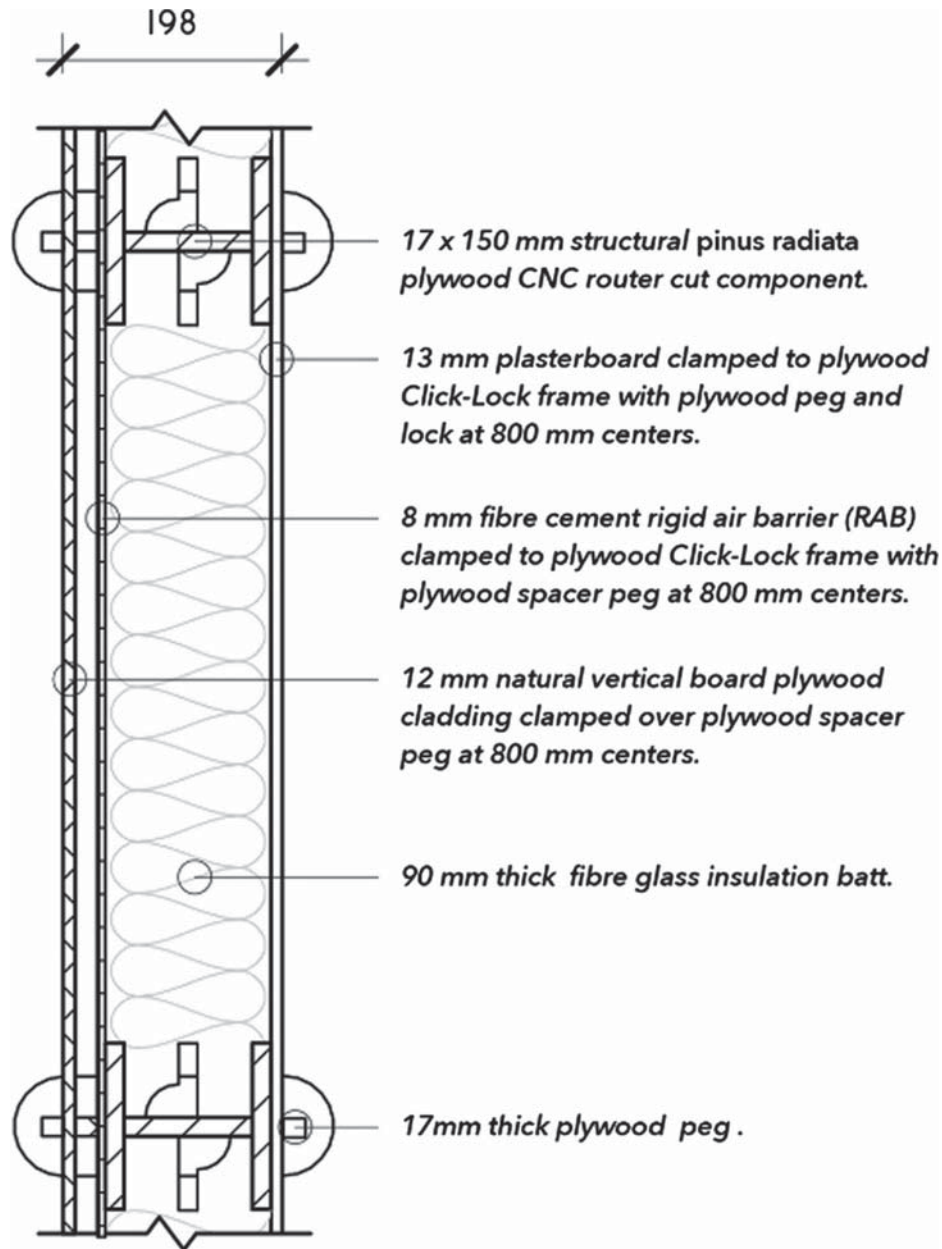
CNC fabricated plywood click-lock wall section detail
